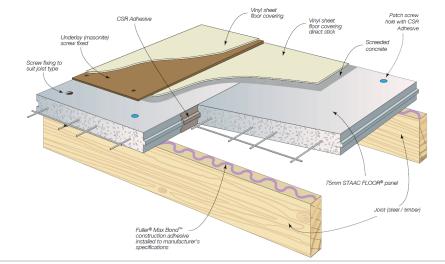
STAAC FLOOR® system with vinyl sheet floor covering
